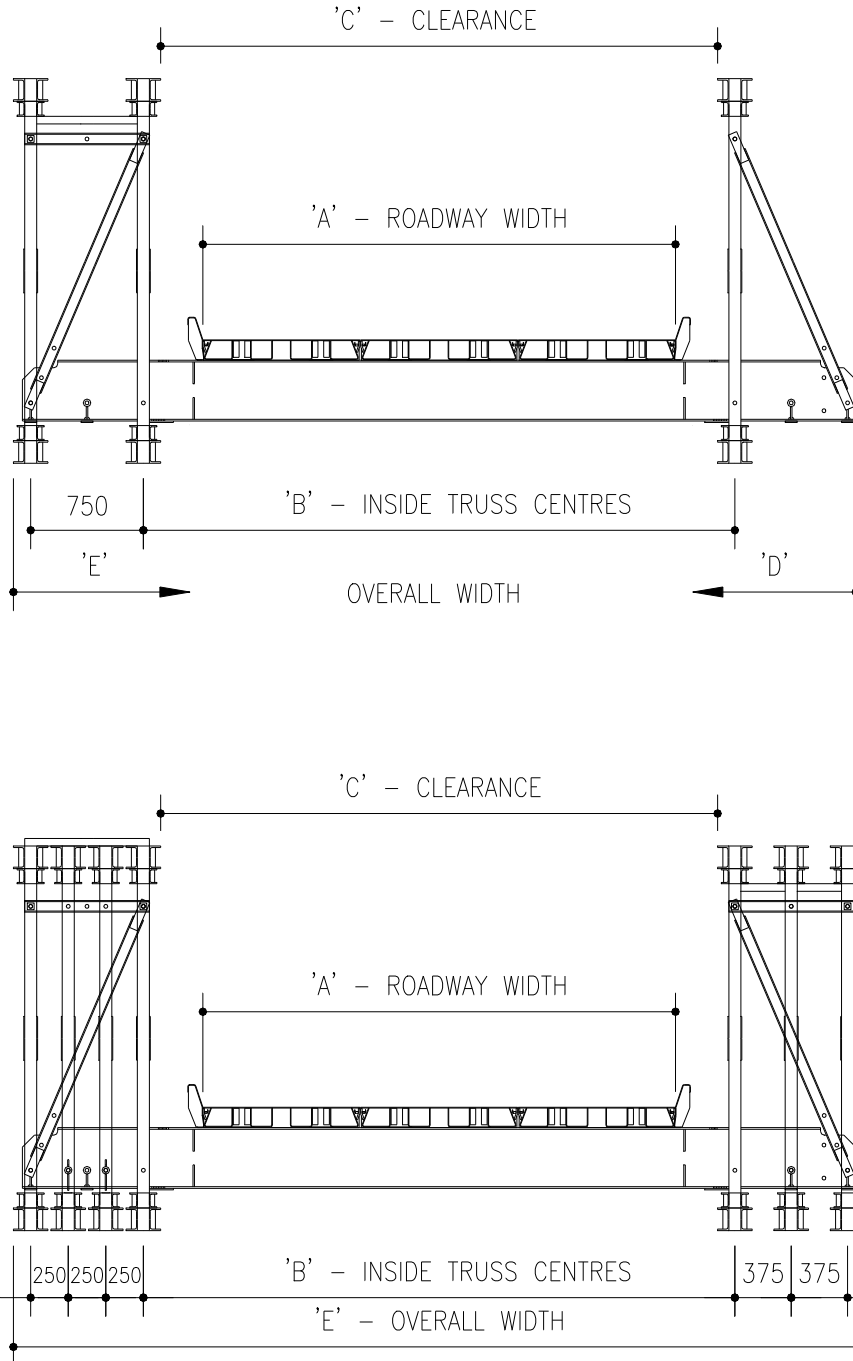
TYPICAL CROSS SECTIONS OF SINGLE STOREY BRIDGES
